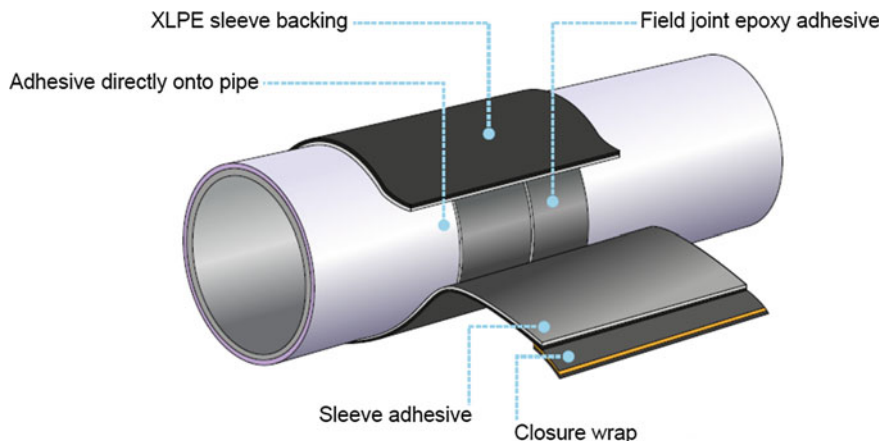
Schematic of the construction of a heat shrink sleeve (HSS) field joint coating
